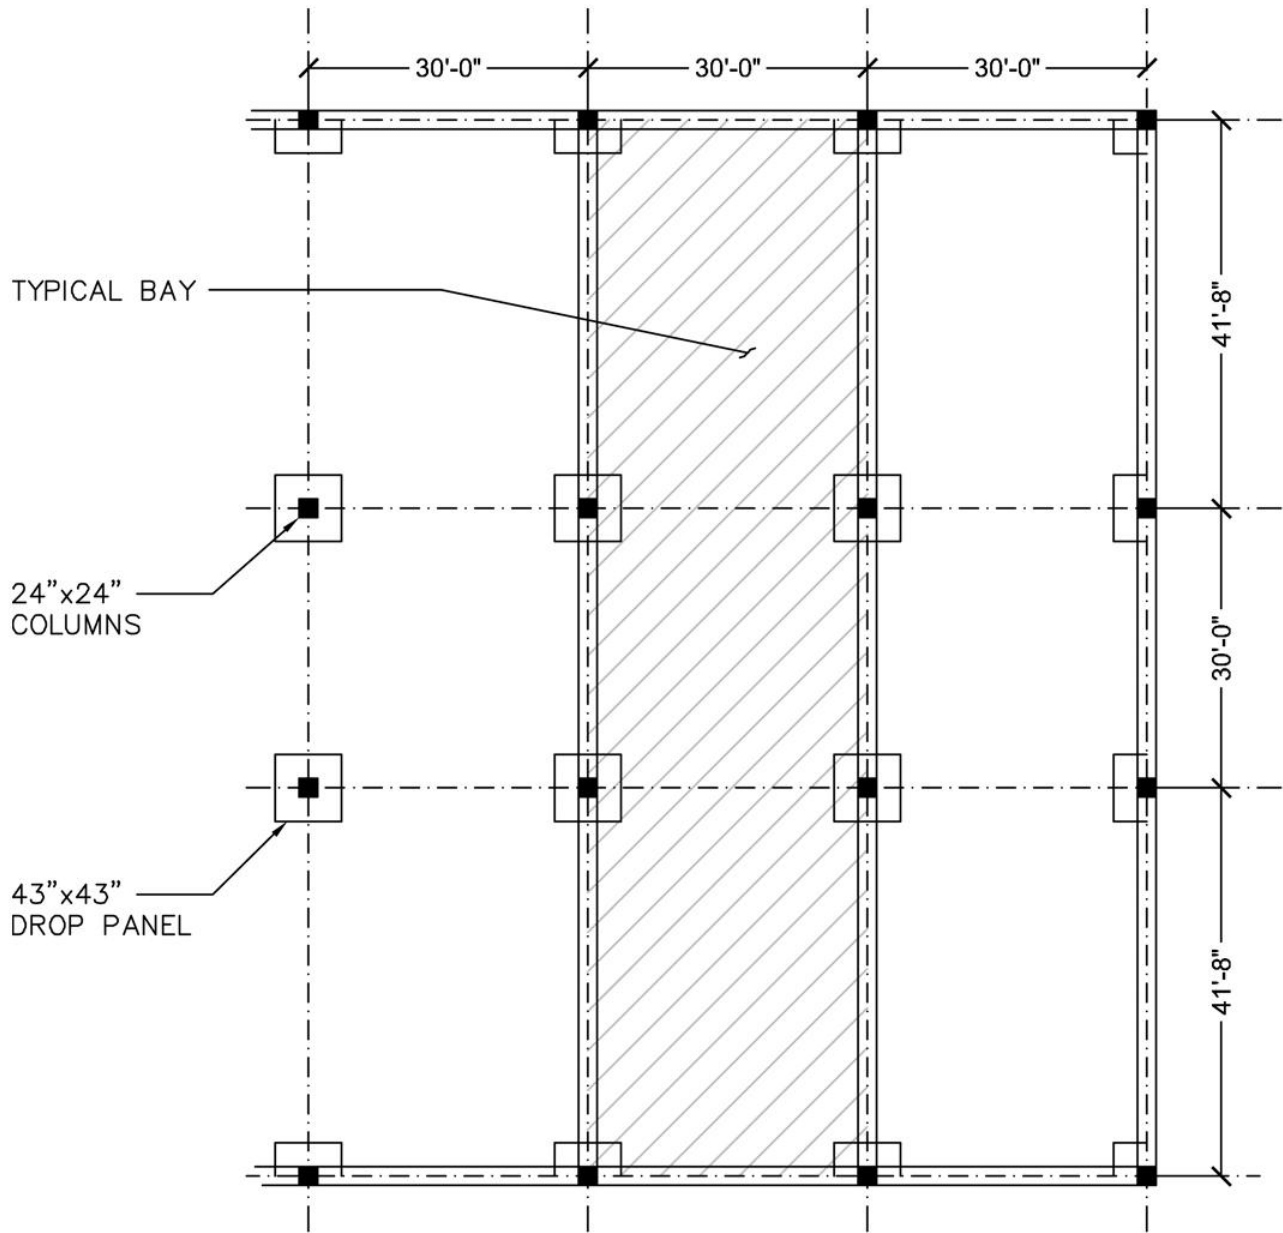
TYPICAL POST-TENSION SLAB LAYOUT
